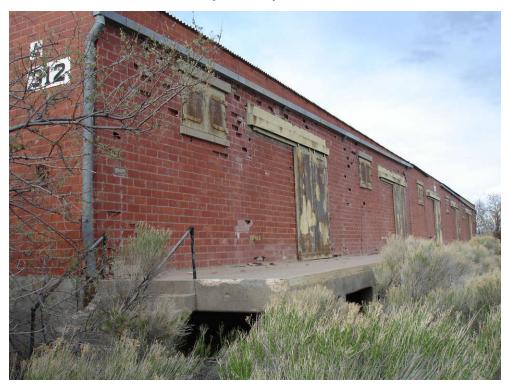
AOC 69, Building 312, Standard Magazine, looking northeast at exterior condition of building.
